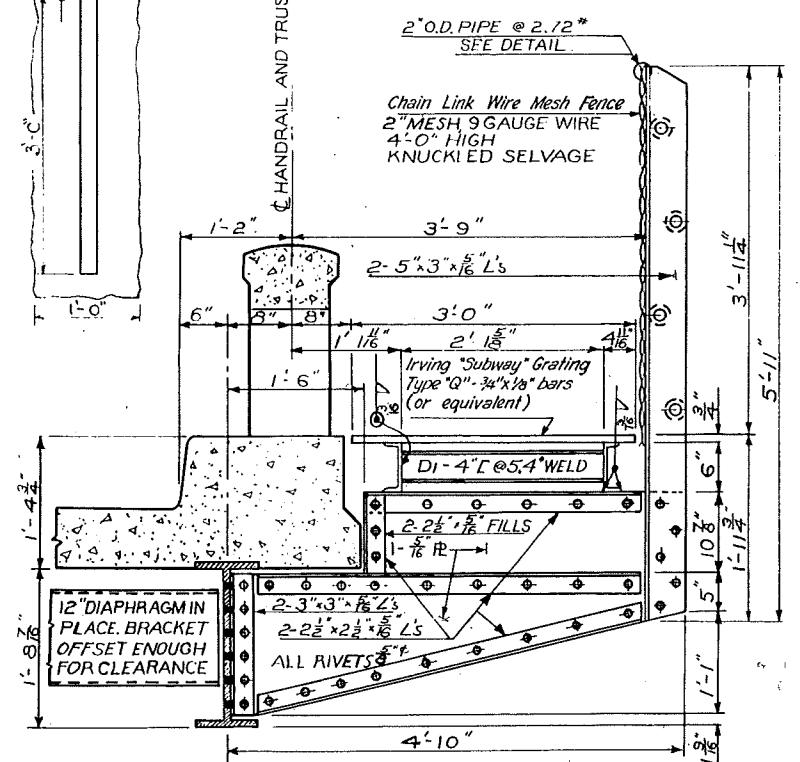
6-REQ'D AT THE MIDDLE OF EACH TRUSS PANEL.
